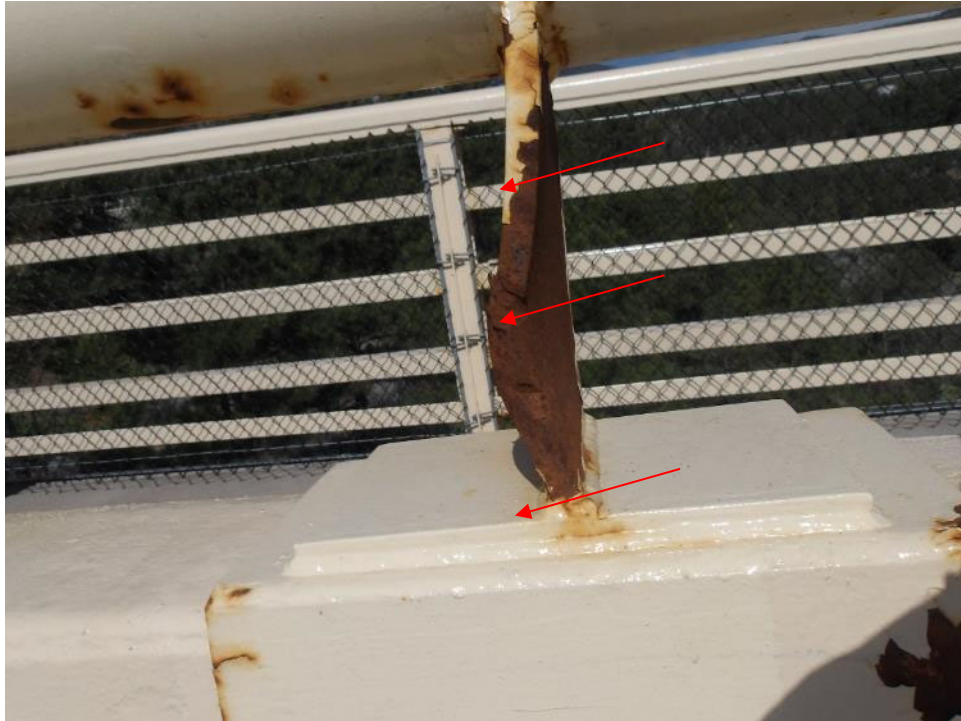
Impact damage to the western bridge rail-concrete barrier rail connection (TYP).
